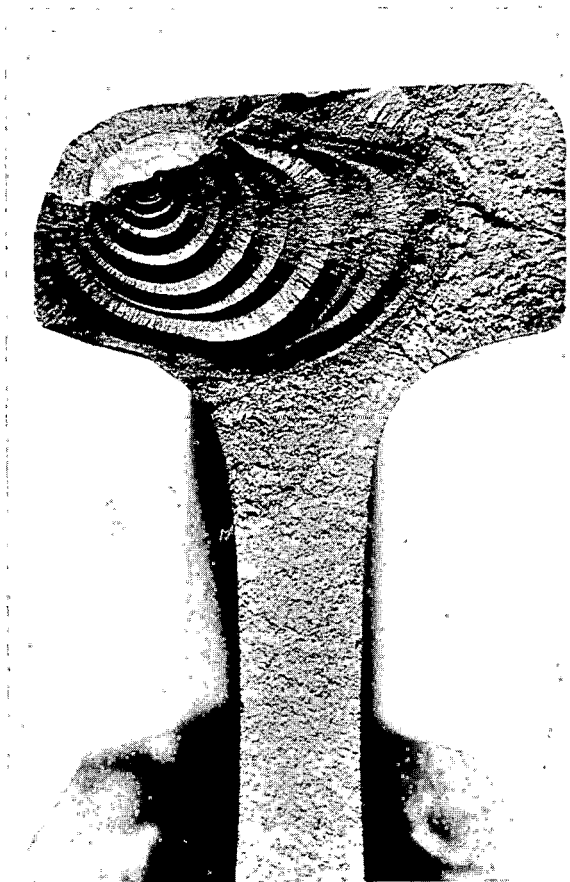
DETAIL FRACTURE FROM SHELL.
